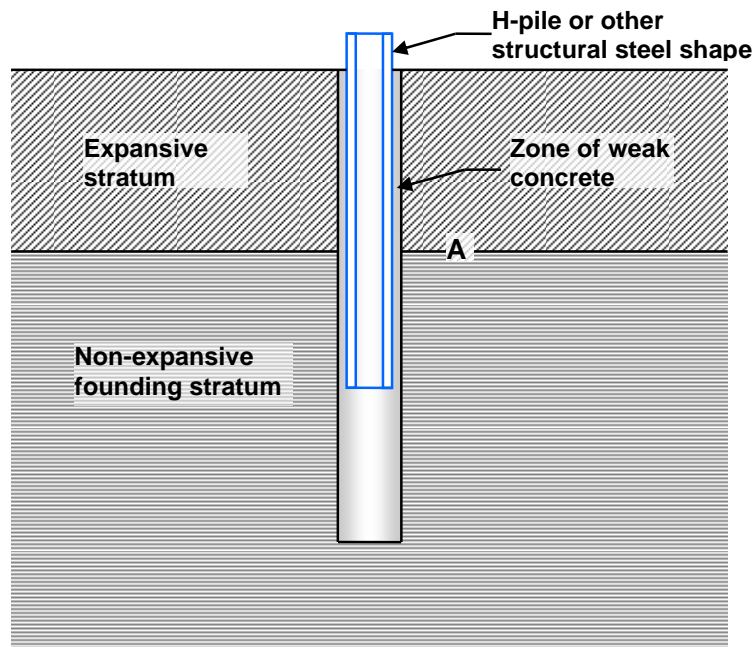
Use of Embedded Structural Shape with Weak Concrete, Procedure B
